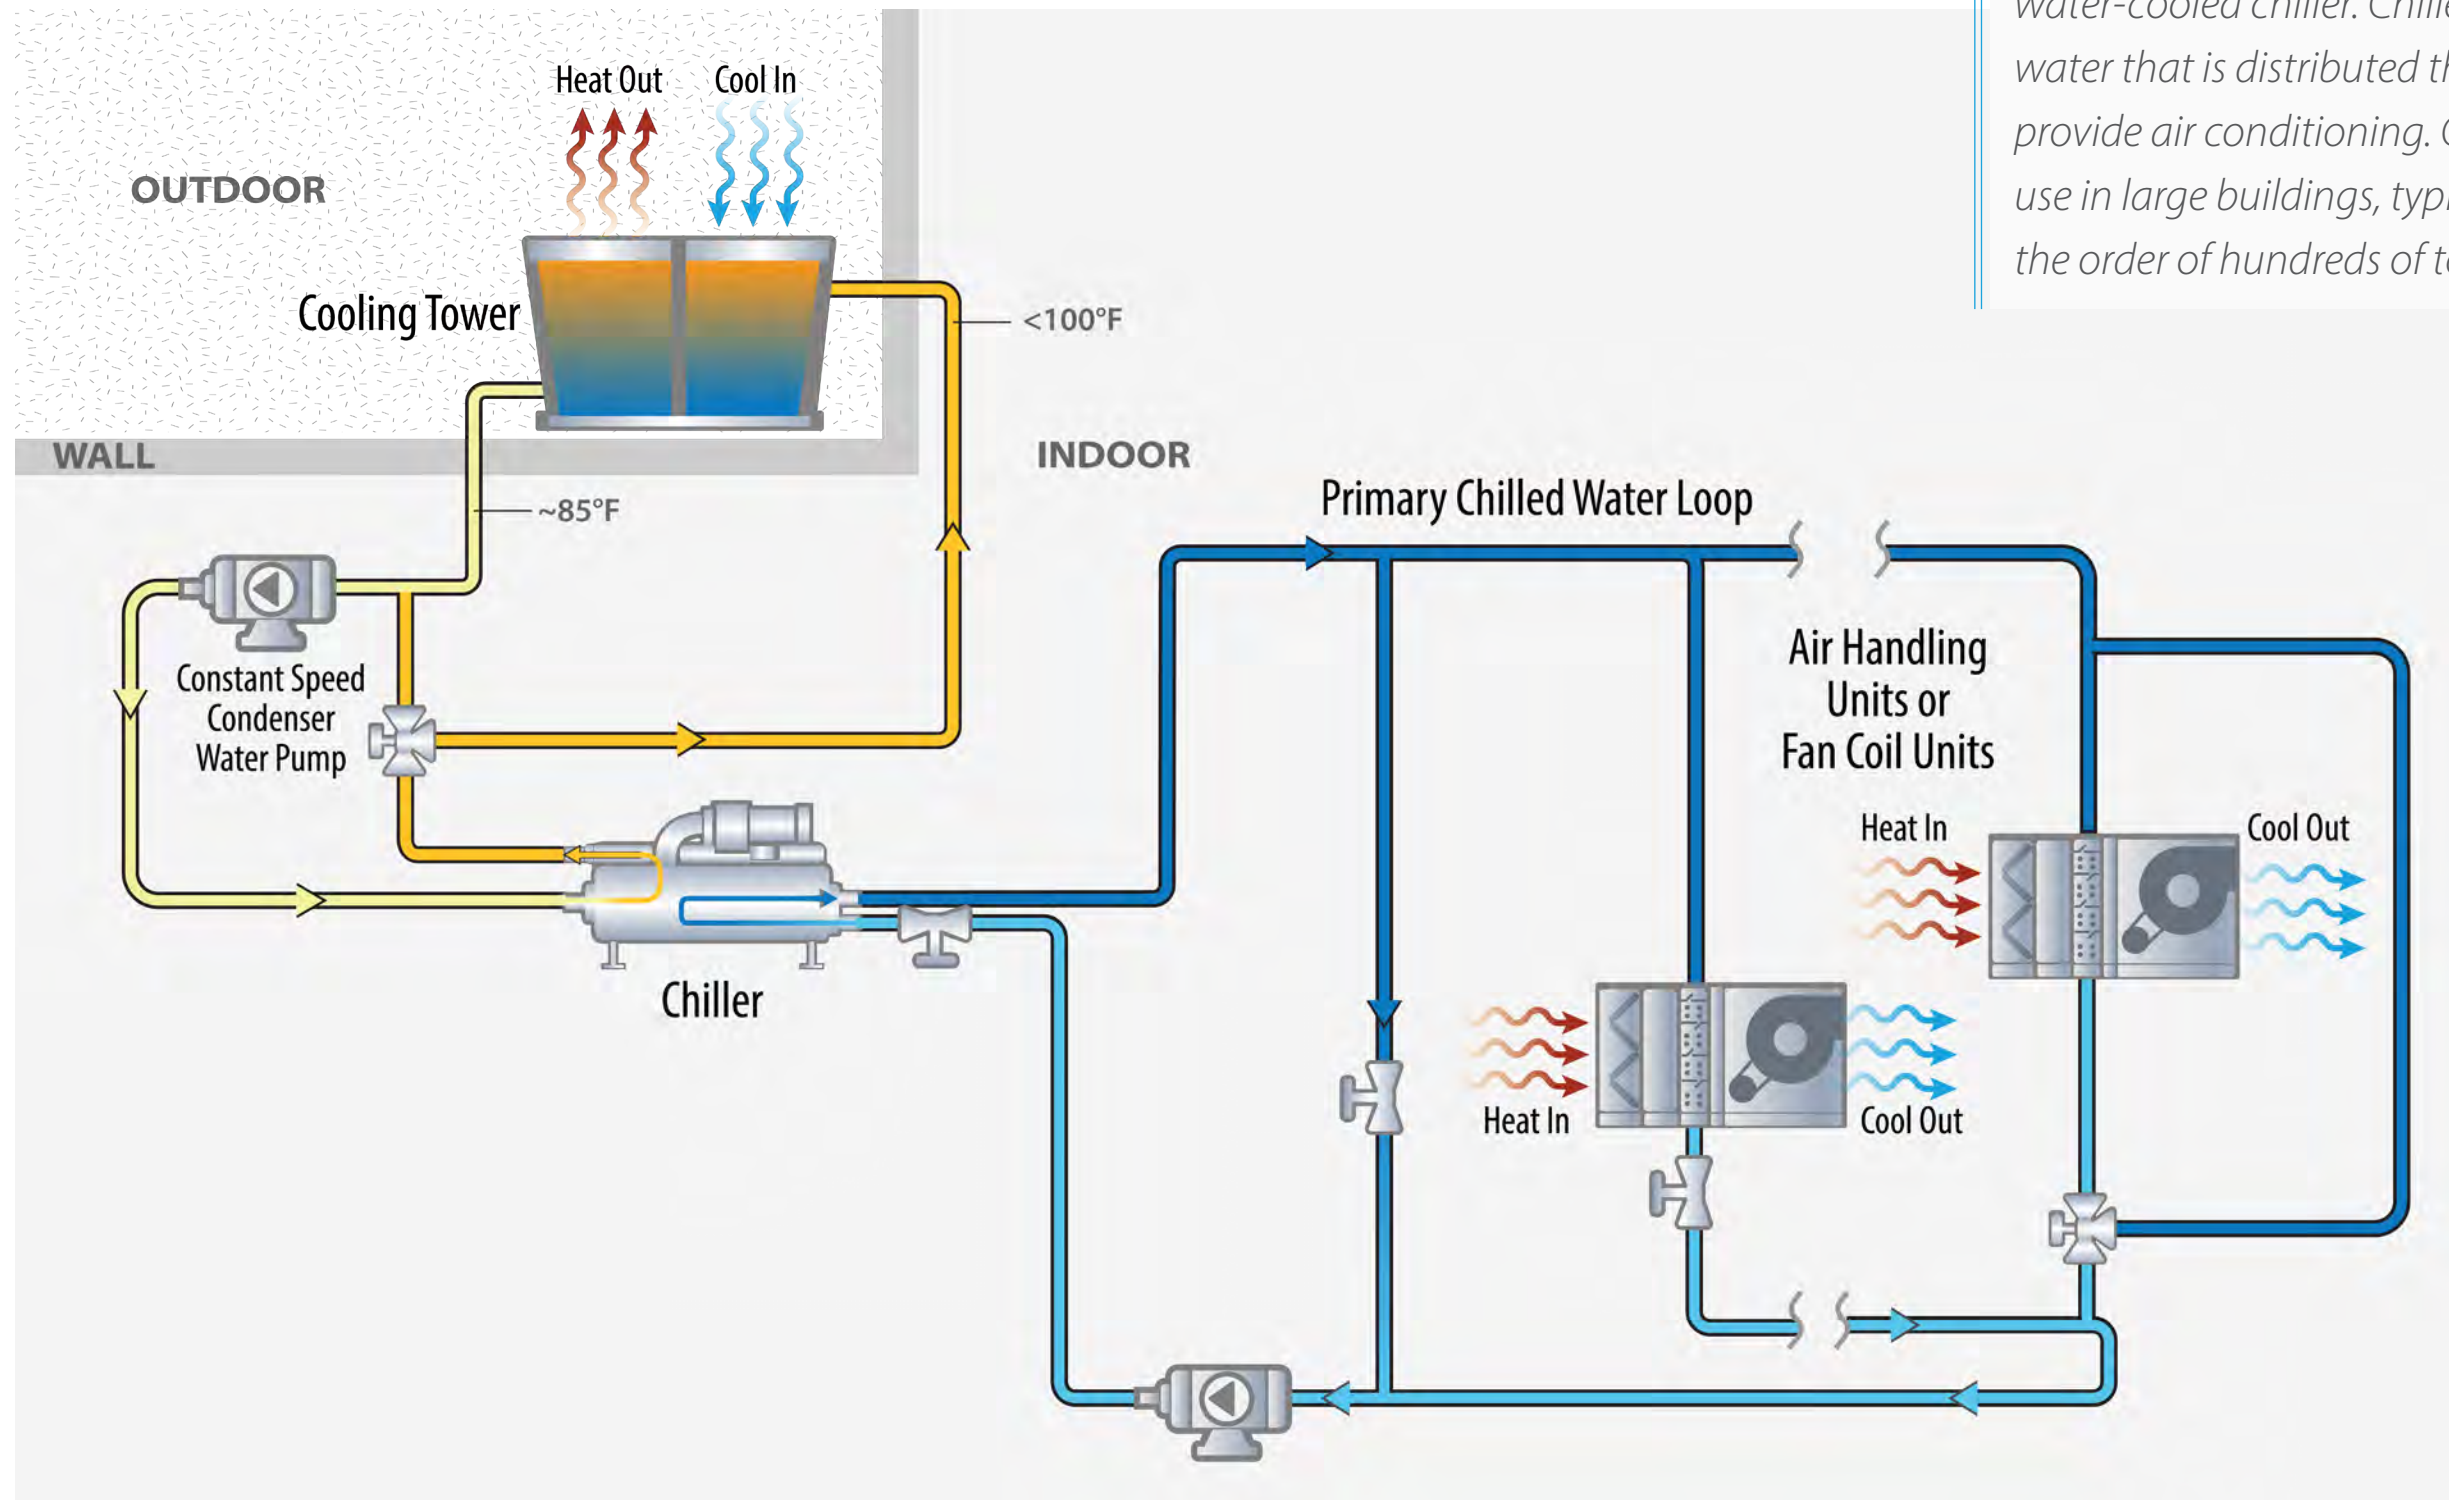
illustrates a basic piping diagram of a water-cooled chiller. Chillers are used to create cold water that is distributed throughout the building to provide air conditioning. Chillers are most suitable for use in large buildings, typically with cooling loads on the order of hundreds of tons.
